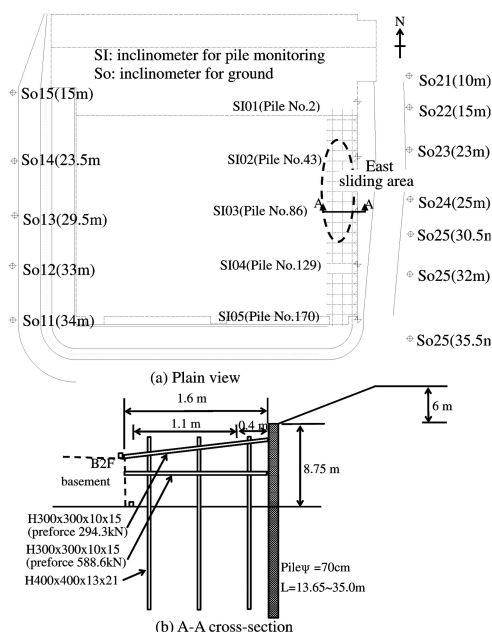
Site arrangement (redraw from Lin et al. 2013).
